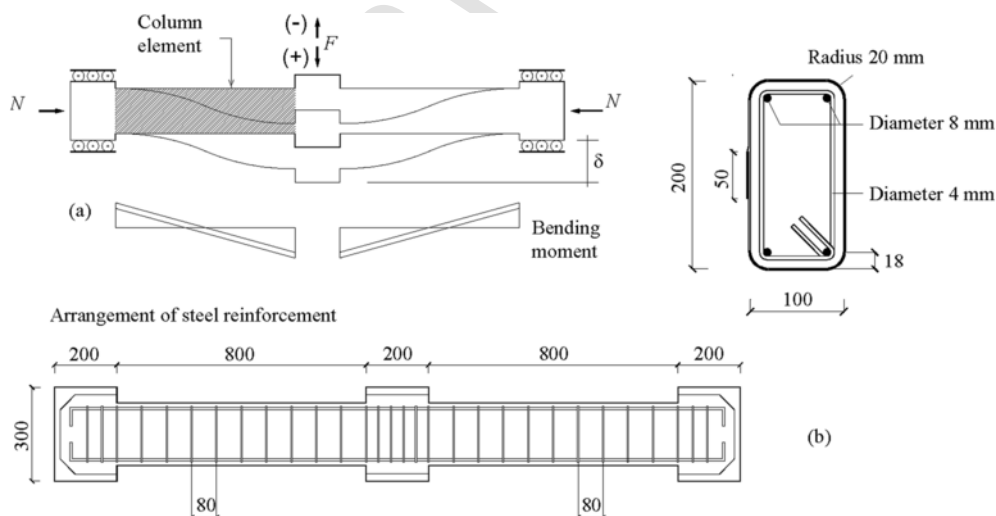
(a) Test setup. (b) Arrangement of the steel reinforcement in the specimens. (Dimensions are expressed in millimeters).
